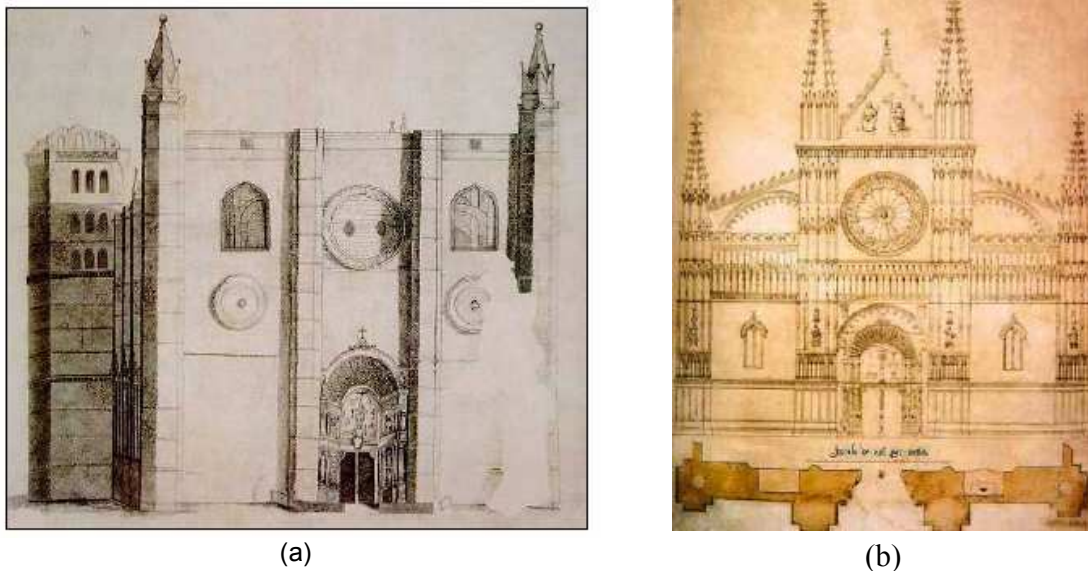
Western façade. (a) Original view before. (b) New façade after reconstruction.
